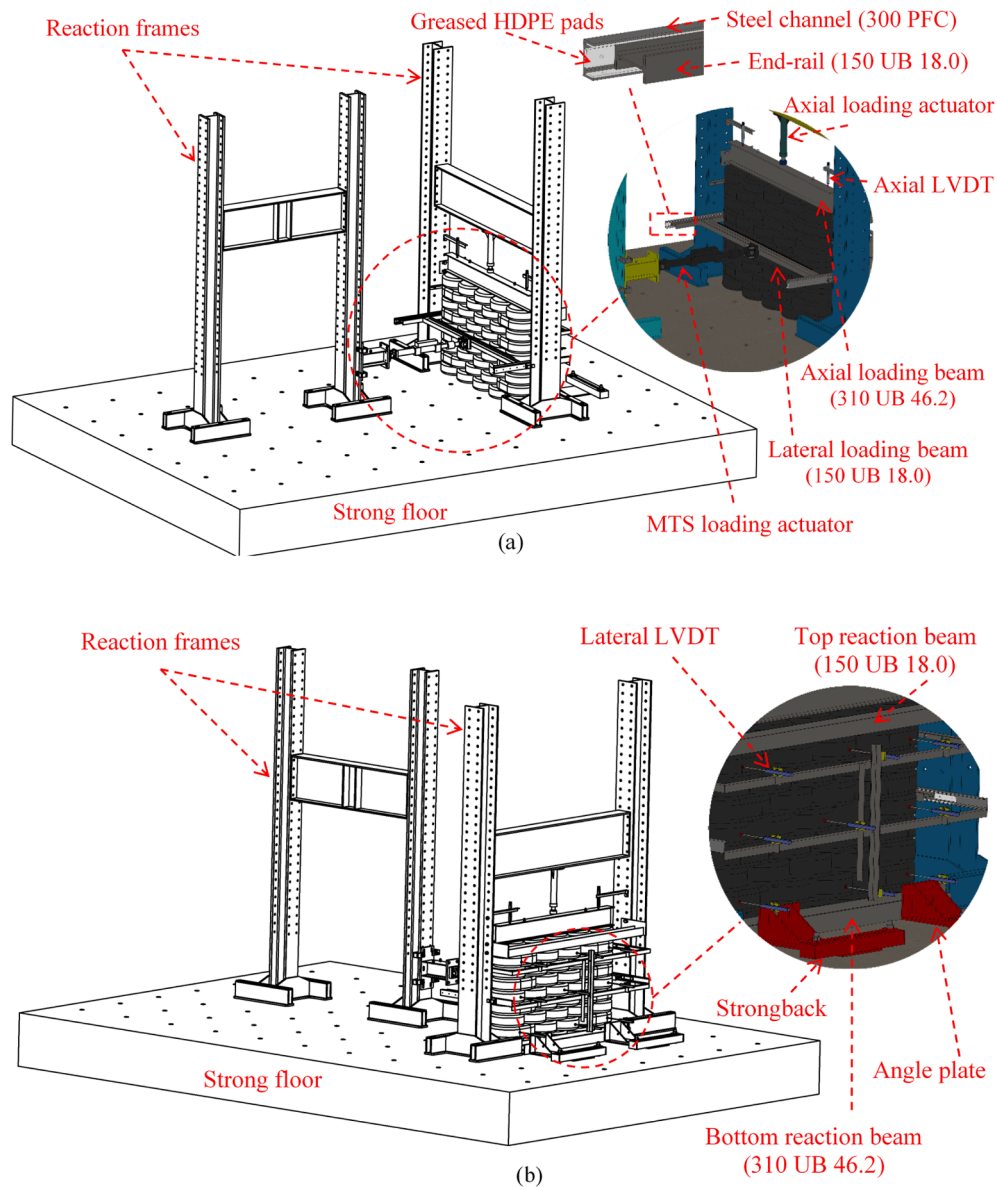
Test setup CAD drawing: (a) Frontside isometric view; (b) Backside isometric view.
